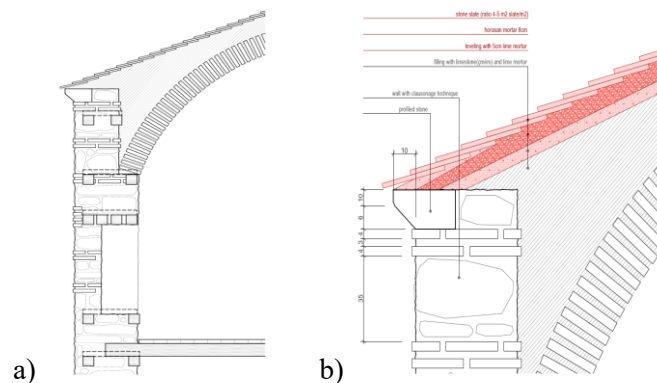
Roof – dome existing section(a) and Roof – dome proposed layers(b)
